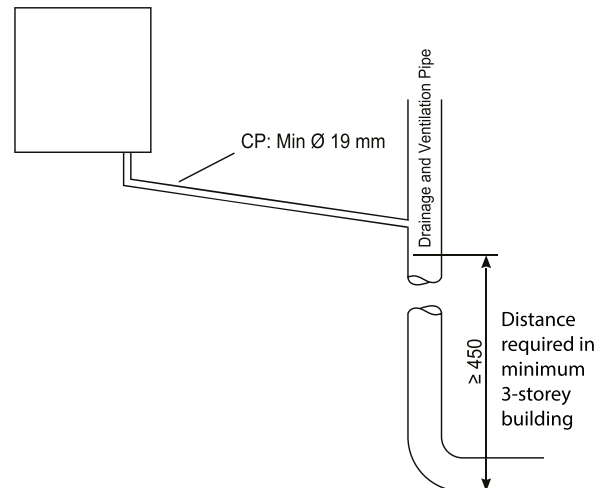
Connection of Condensing Water Drainage Pipe to Internal Drainage and Ventilation Pipe
